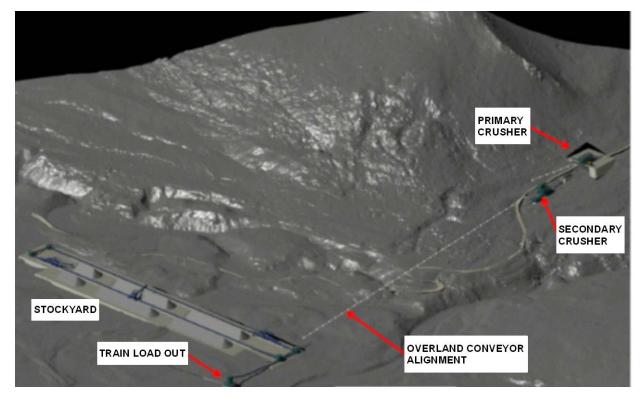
Mine Site Primary and Secondary Crushing
